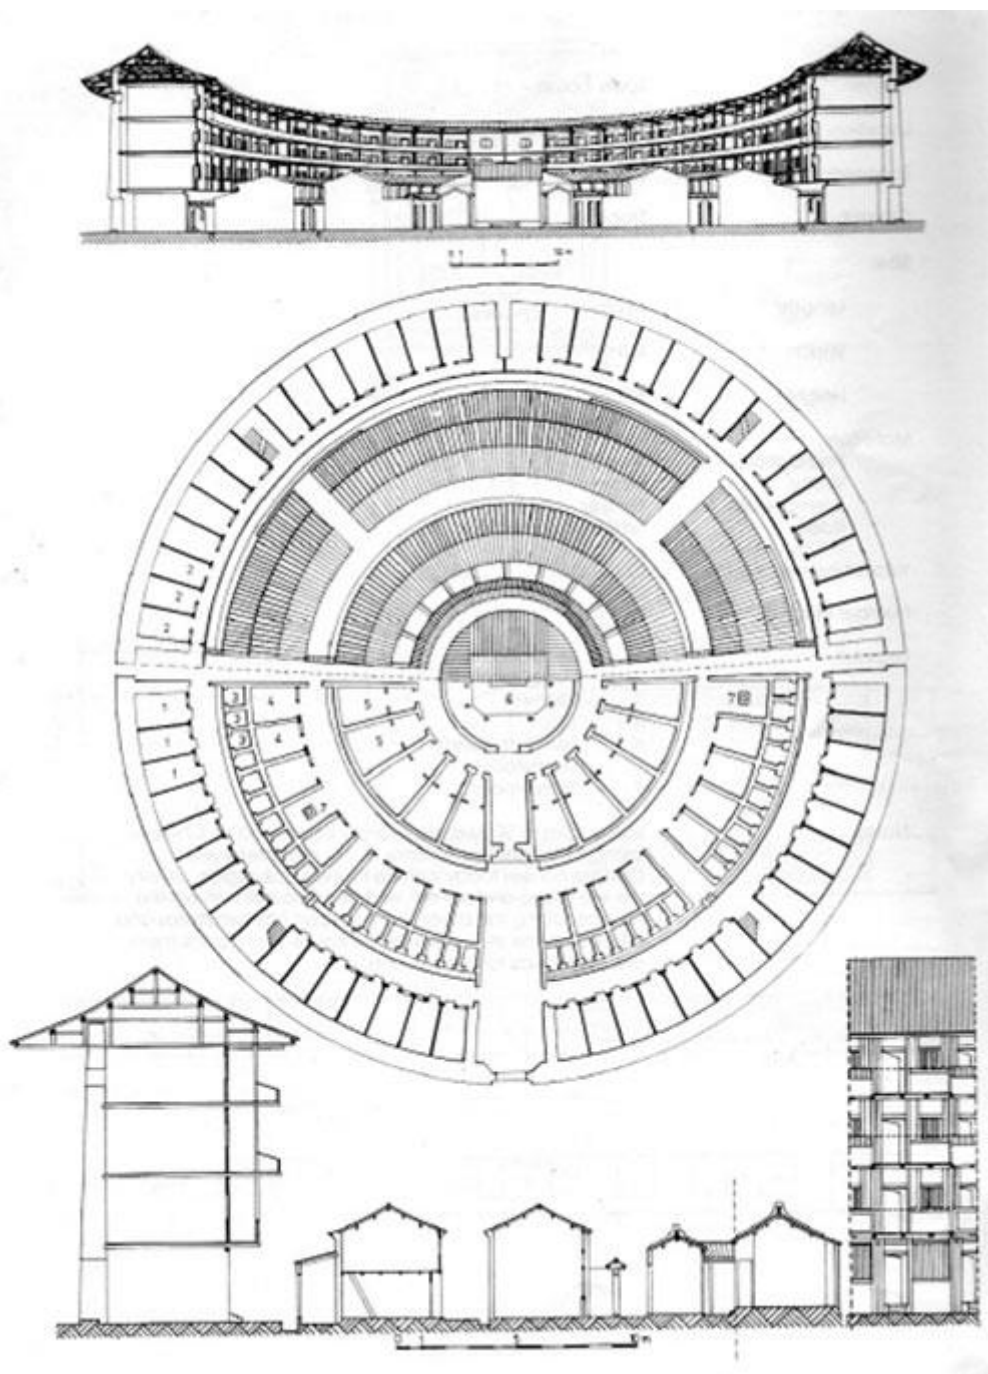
Typical Tulou communal dwelling in Southern China (elevation, plan, and section)
